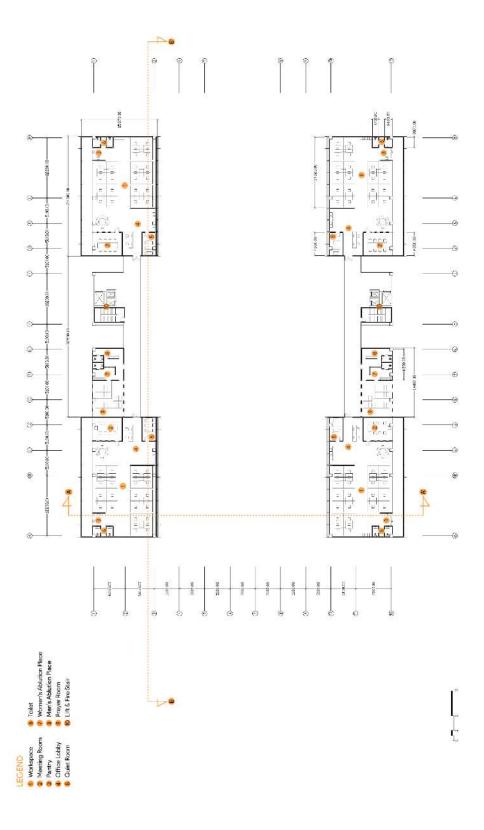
6th Floor Plan (Source: Personal Illustration)
